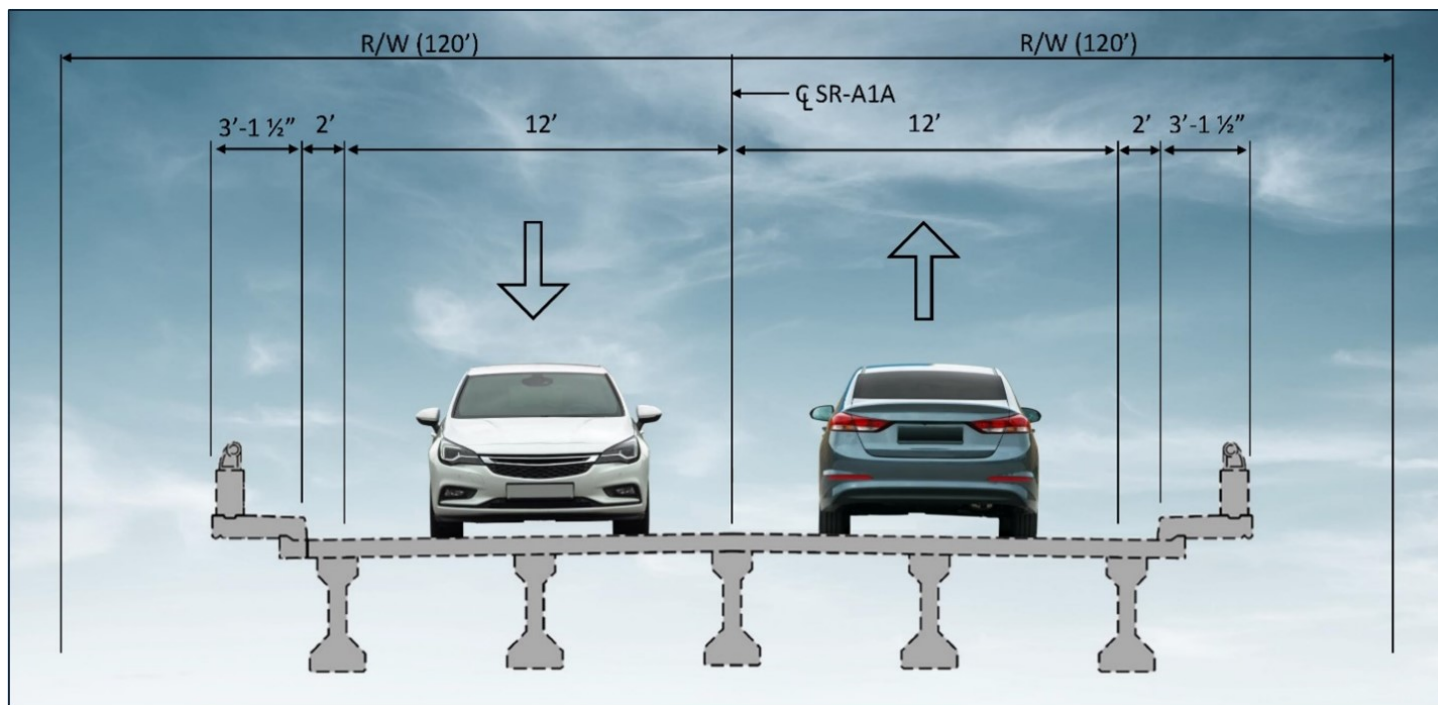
EXISTING SR A1A BRIDGE TYPICAL SECTION
